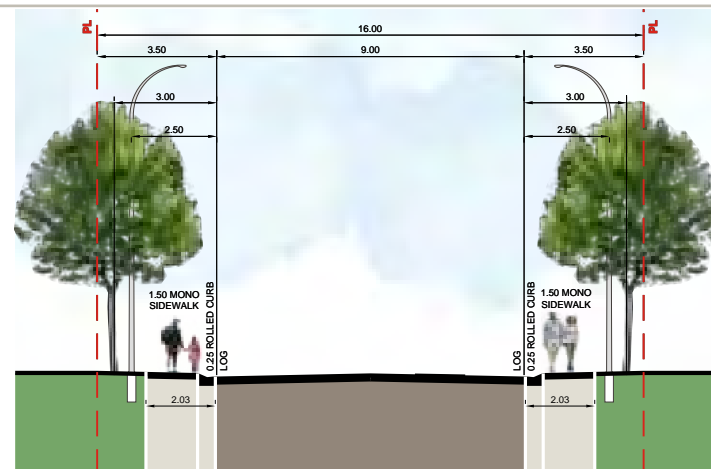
MODIFIED RESIDENTIAL ROAD SECTION (18.6M)
